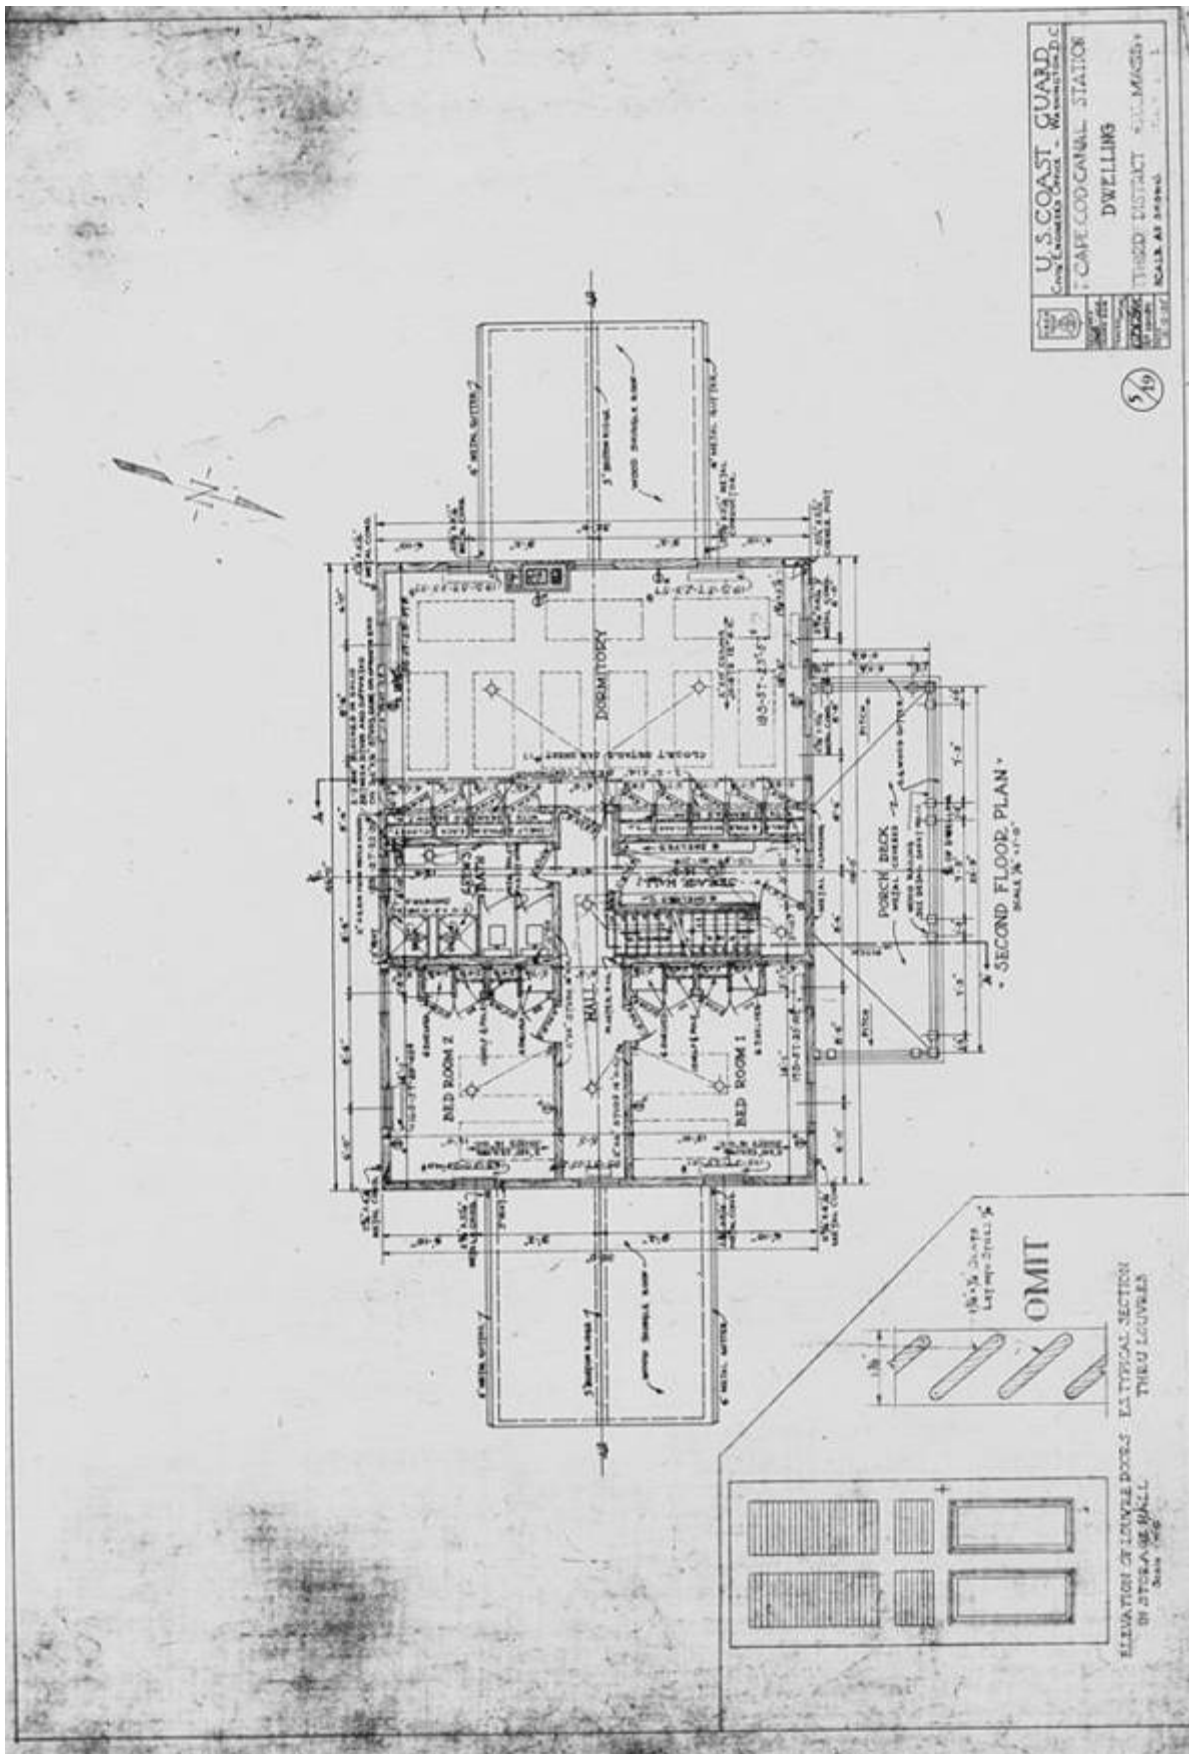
New Deal-era Coast Guard Station dwelling for Cape Cod Canal Station, second-floor plan, 1935.
